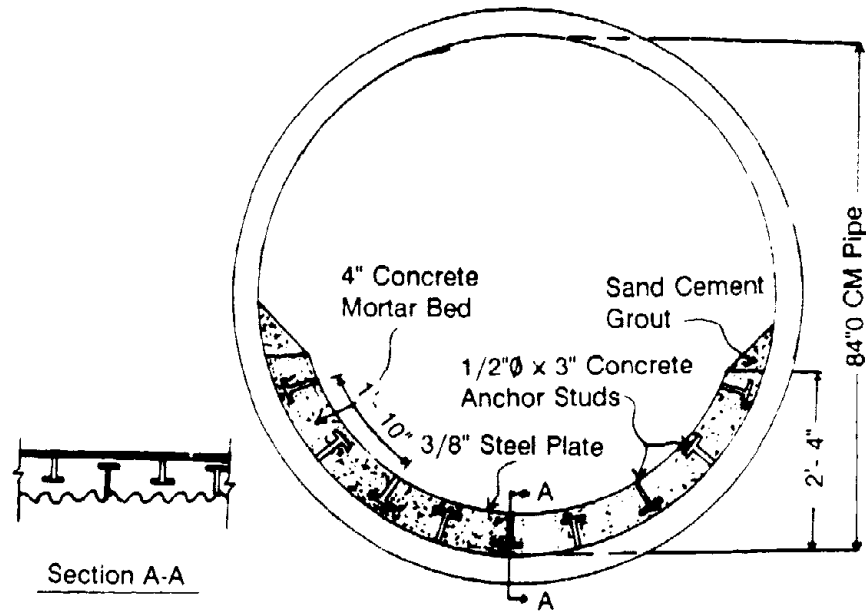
Armor plate typical section. ⁽¹⁾
